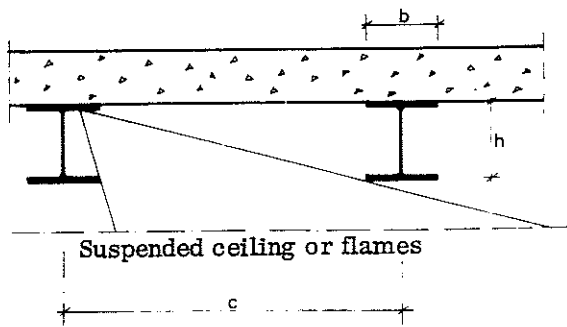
a. Floor construction where the flames or suspended ceiling are in their entirety below the floor girders
